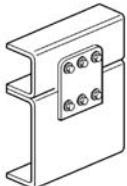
Contact of the bolt thread with the hole wall ESC-029
